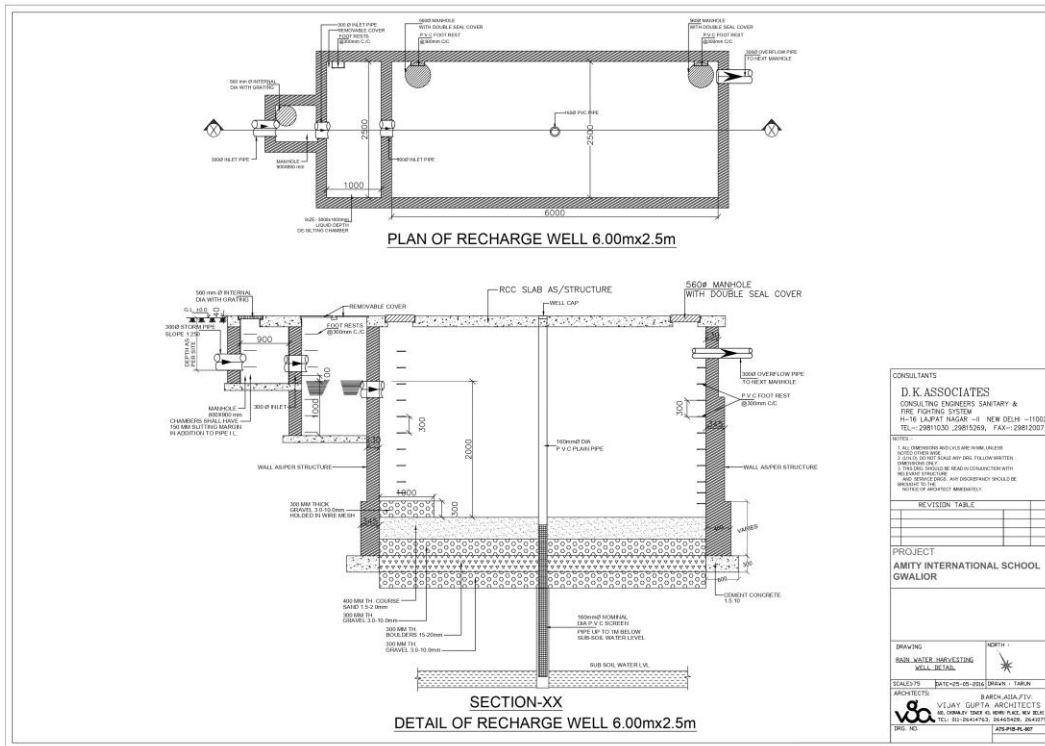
Plan and cross section of Rainwater Harvesting Pit
